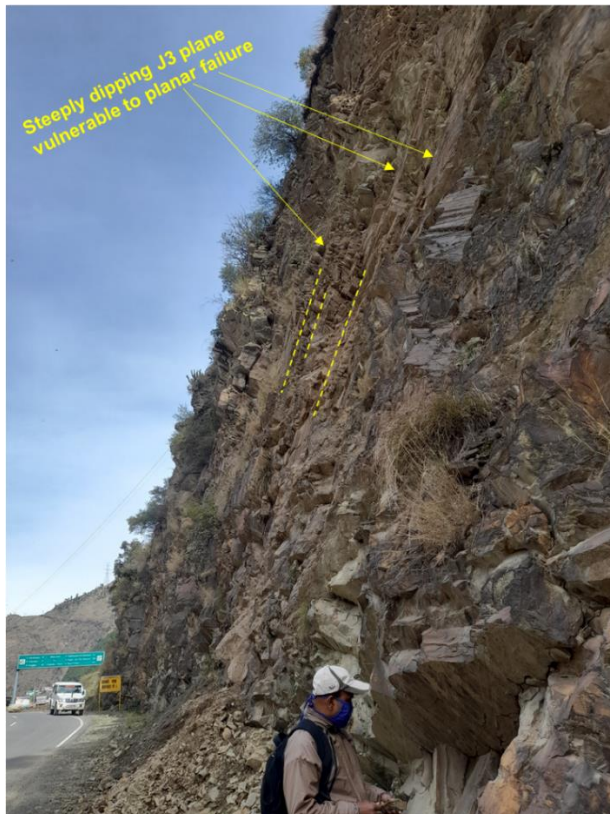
The vulnerable planar failure along J3 plane as seen on the slope towards Chamba-end.
